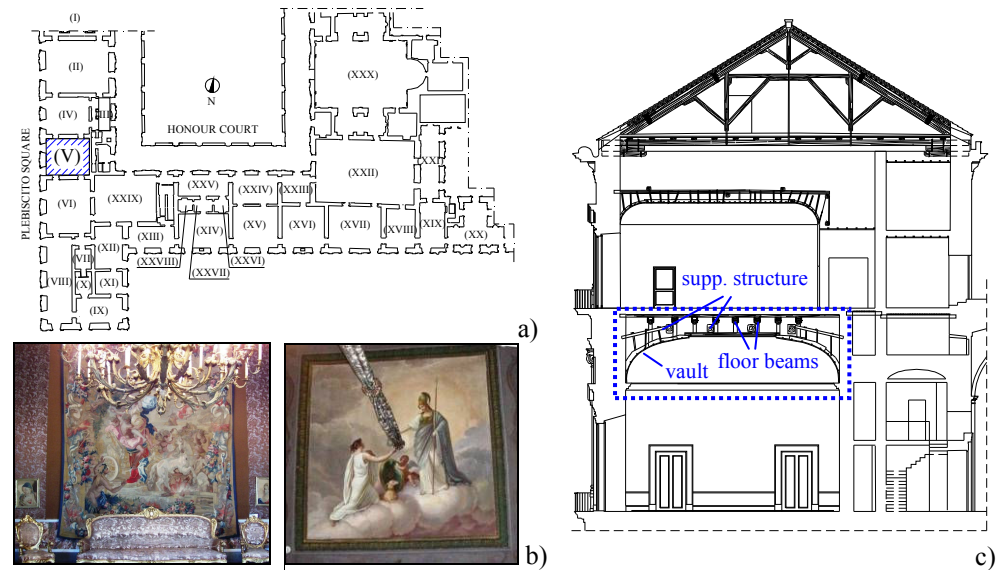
Third Anteroom (V) – Geometrical survey: a) Plan layout; b) Internal view and vault fresco; c) Structural section of the Royal Palace at the Hall V location.
